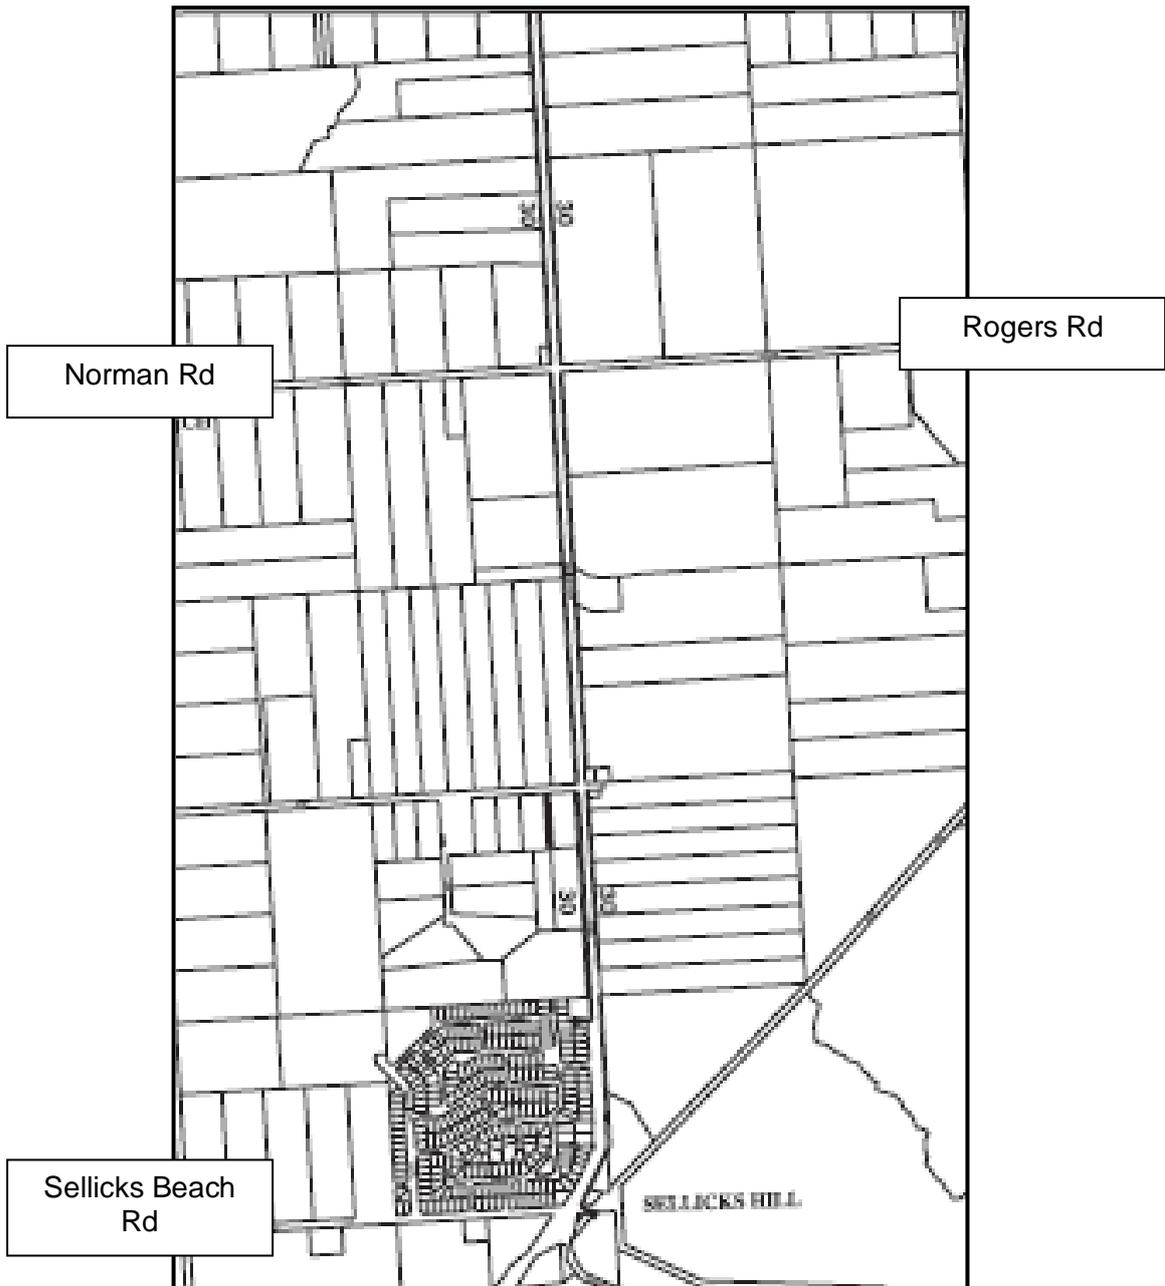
(c): Metropolitan Adelaide Road Widening Plan (MARWP) Requirements on Main South Road
